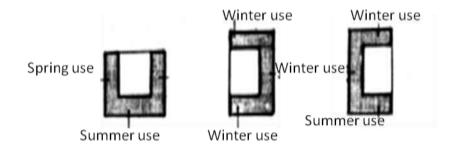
U types plan in Diyarbakir traditional houses(Bekleyen&Dalkiliç,2011)
